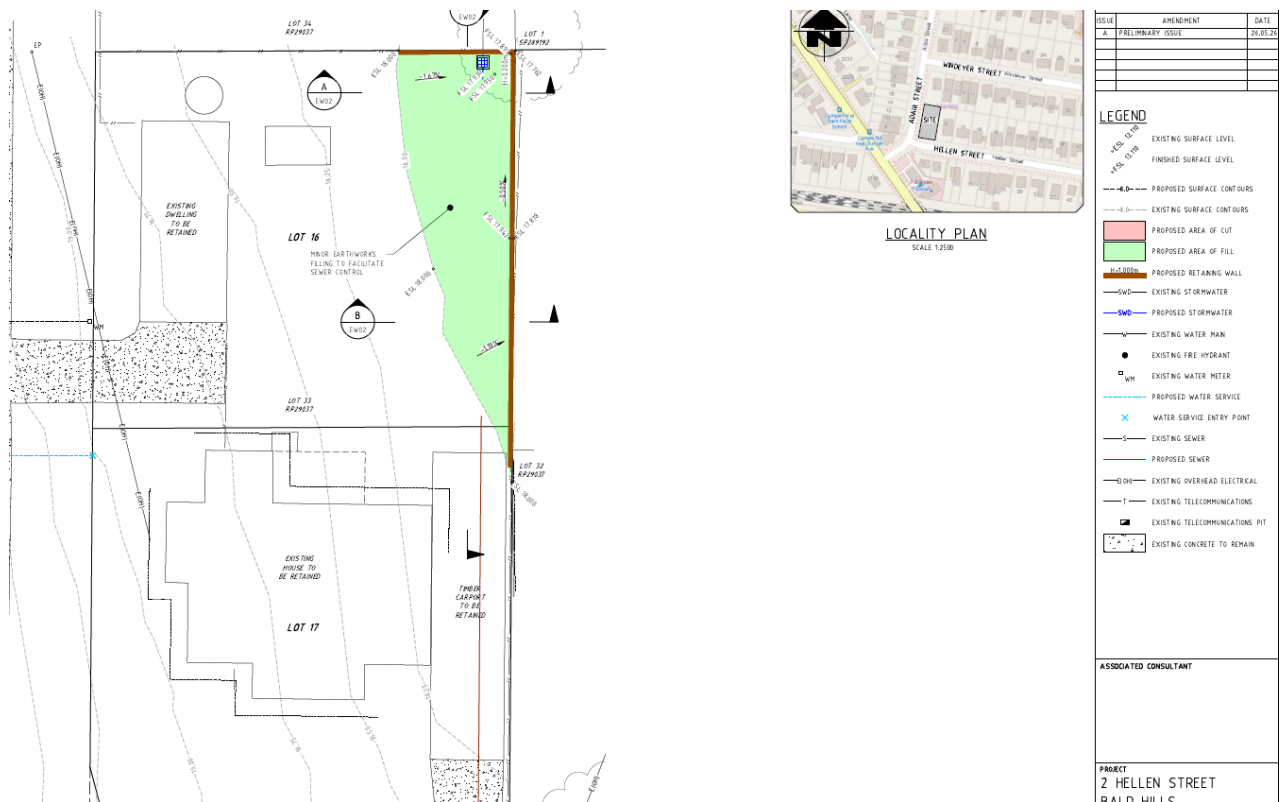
Civil Engineering Plan - area of proposed fill (Source: Civil works engineers).
